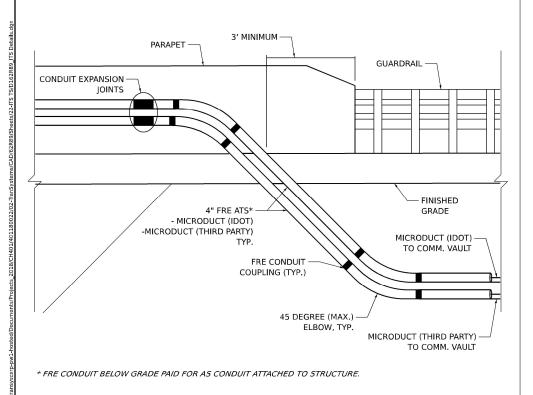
WB OVER MIDLAND AVE BRIDGE PARAPET CROSS SECTION
